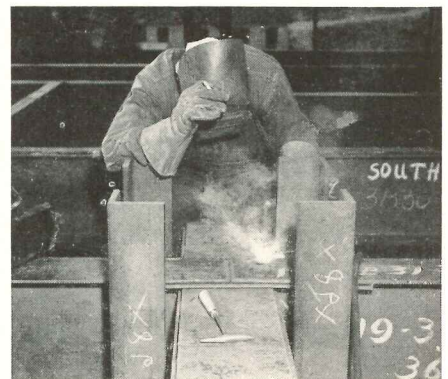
Beam and girder connection made through open box column permits easy downhand welding.
